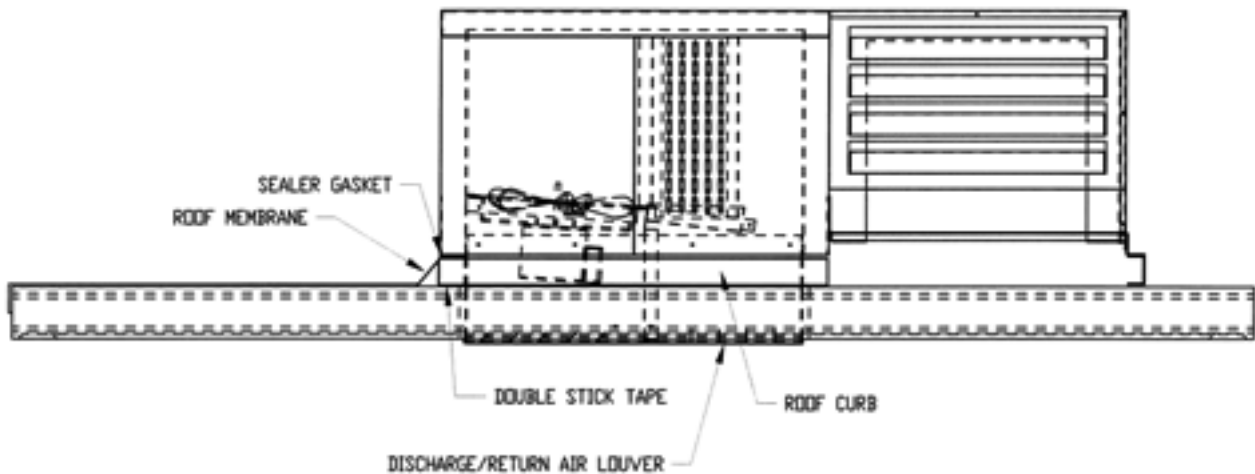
Installation of the Roof Curb and Membrane for Outdoor Top Mount Polar-Pak Units
